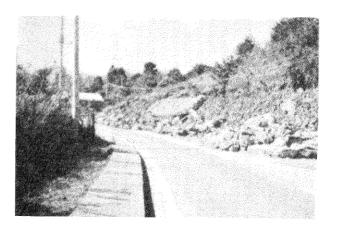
FAILURE OF MASONRY WALL AT INATORI AREA IN HIGASHI--IZU TOWN (ROUTE 135)
